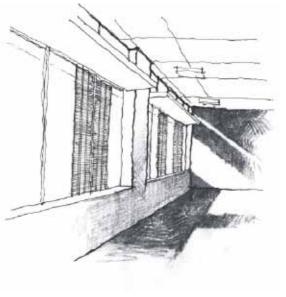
Articulation of interior spaces through in-situ cast light shelves
